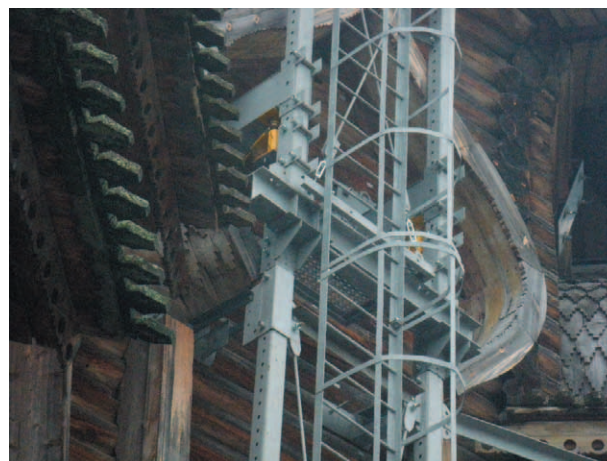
Equipment of lifting system with crossing platforms and staircases with protection baskets
